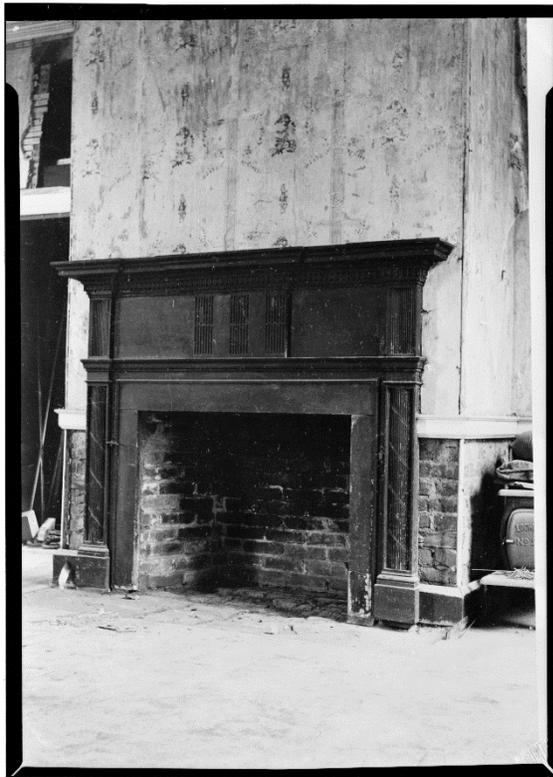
View of the fireplace mantel and surround in room 103 ca. 1960. Note floral pattern of wallpaper above mantel. (Photo courtesy of HABS).
